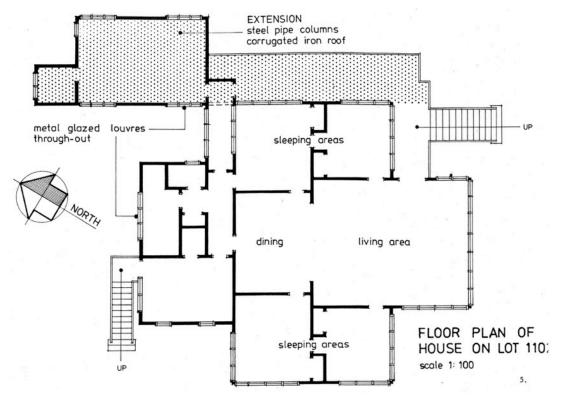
'Floor plan of house on Lot 1102' [Magistrate's House] (Hunt, 5).
